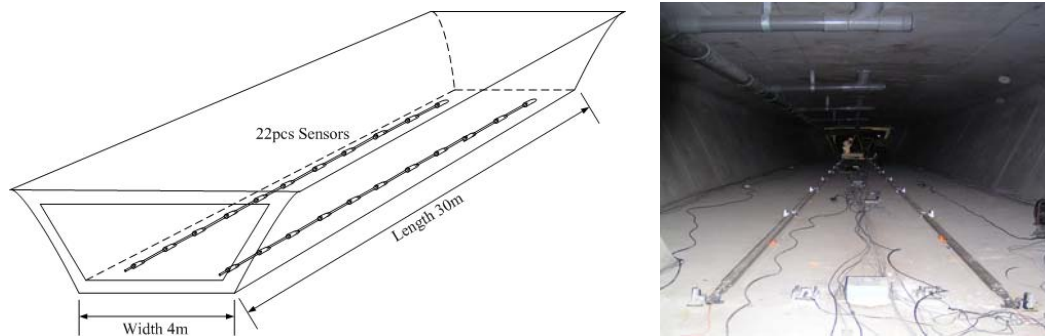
Left, 3-D pictorial drawing of the girder structure with sensor layout. Right, actual sensor layout inside the girder, shown with other conventional sensors installed.
